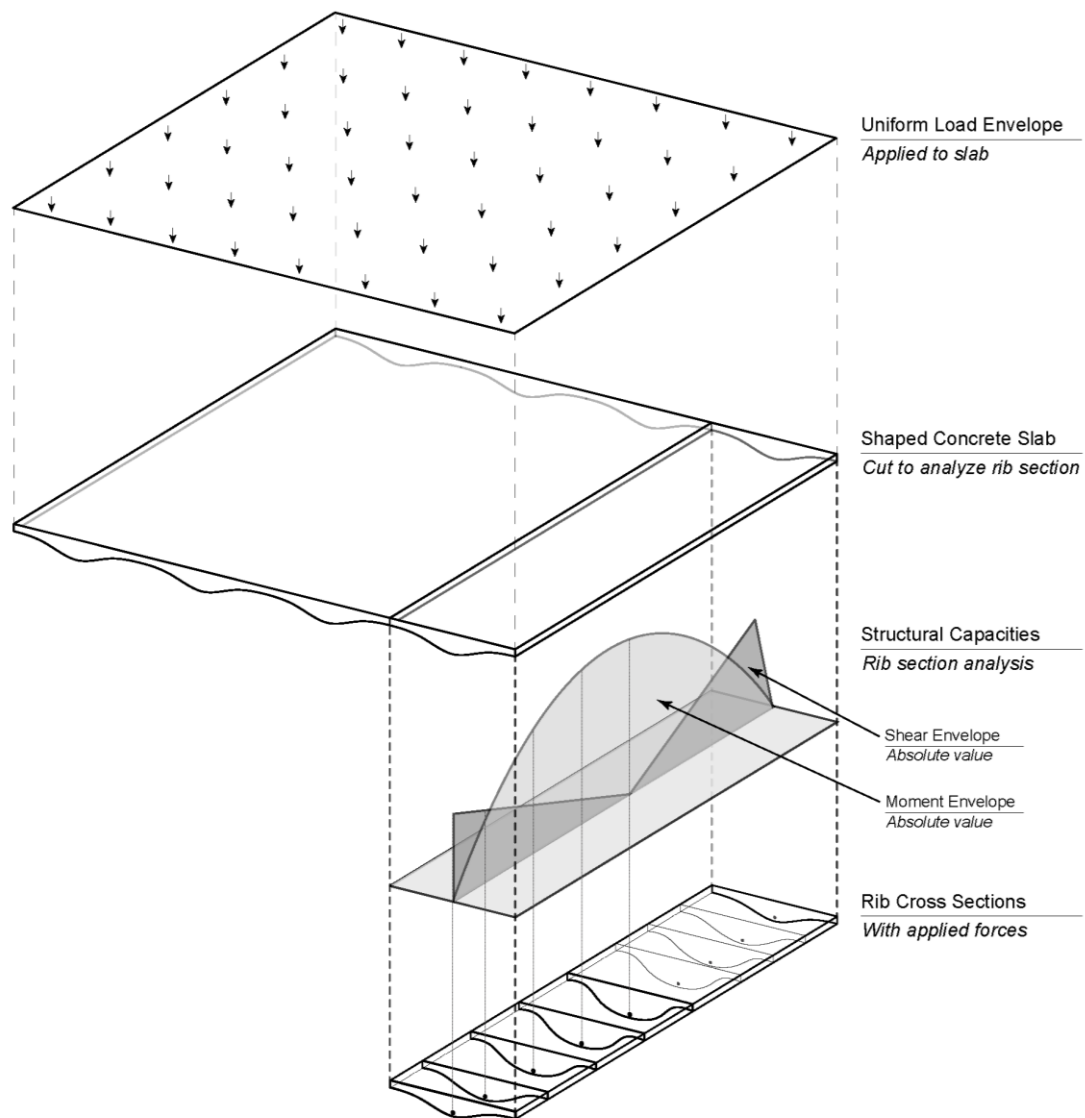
Structural analysis of a concrete rib section (adapted from Ismail, 2019).
